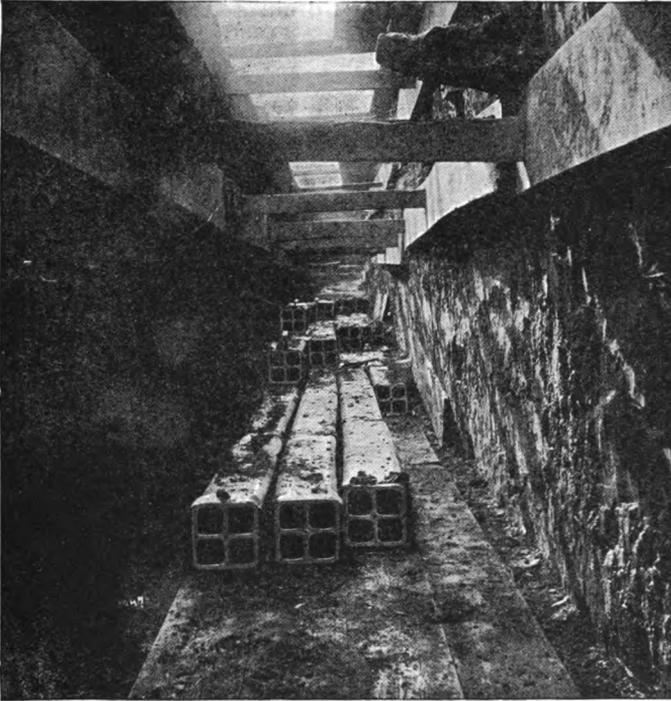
Multiple Duct Conduit with Timber Foundation.
